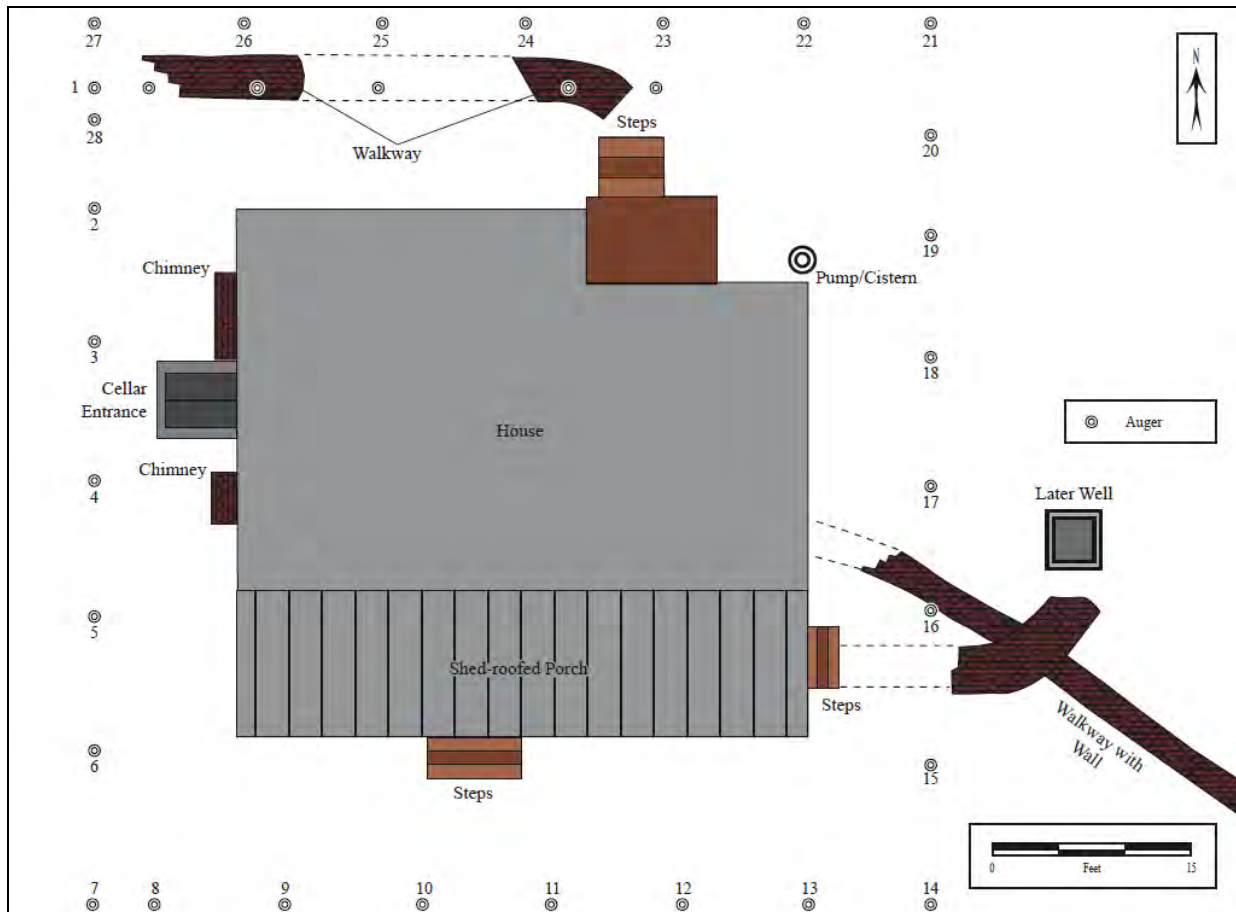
Plan view of Spring Hill house illustrating identified walkways and fence post hole locations. Source: TRC.
